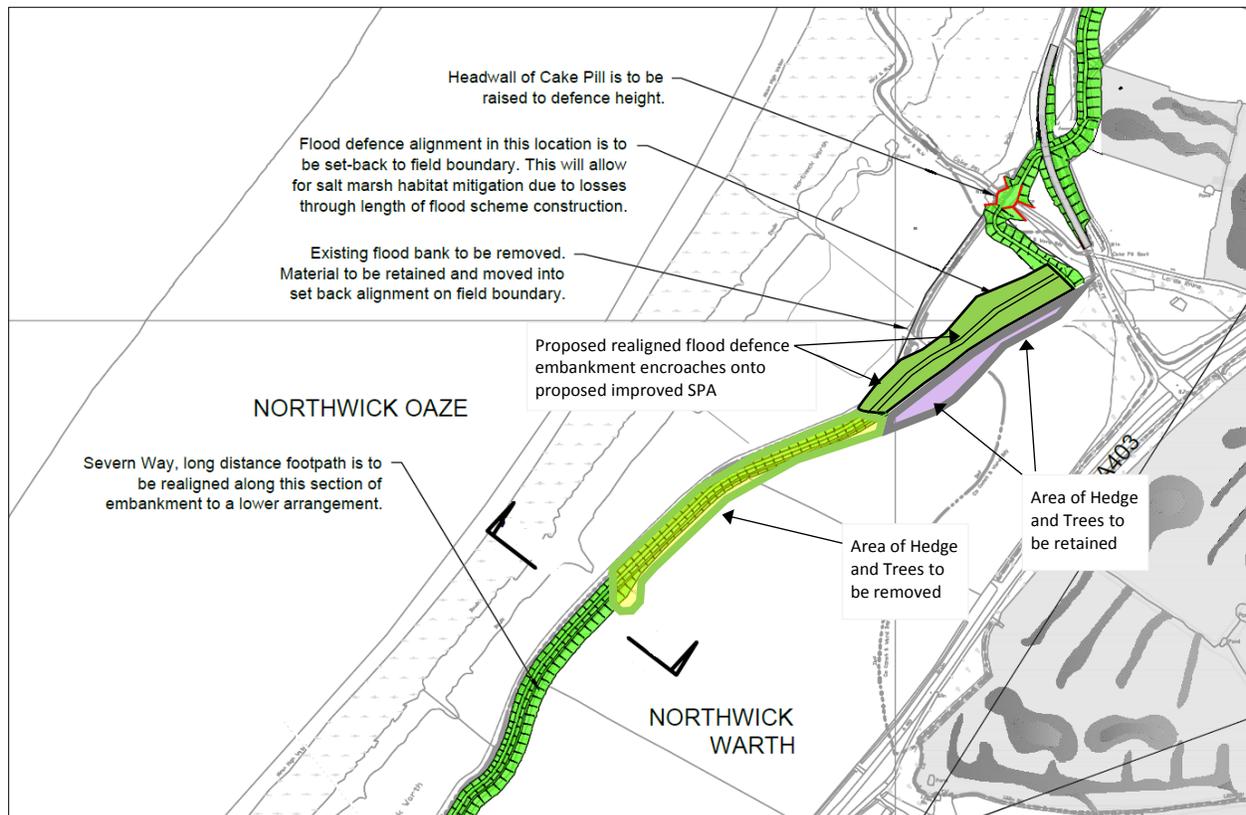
Plan of Alternative Flood Defence Embankment Encroaching into Proposed Habitat Area at Cake Pill
